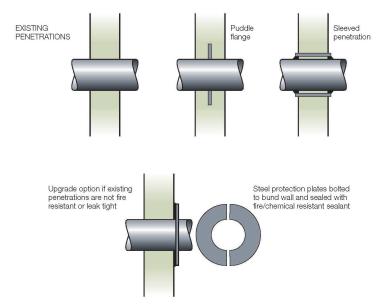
Steel split fire protection plate (from HSE, 2009a)
